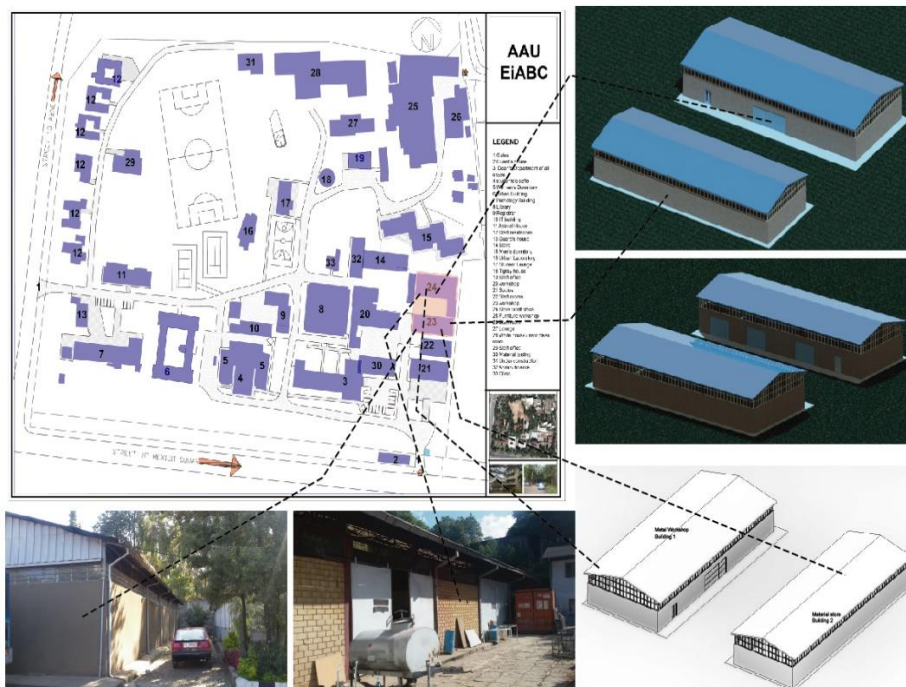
Location of Workshop buildings, EiABC campus, (Source: Author)
